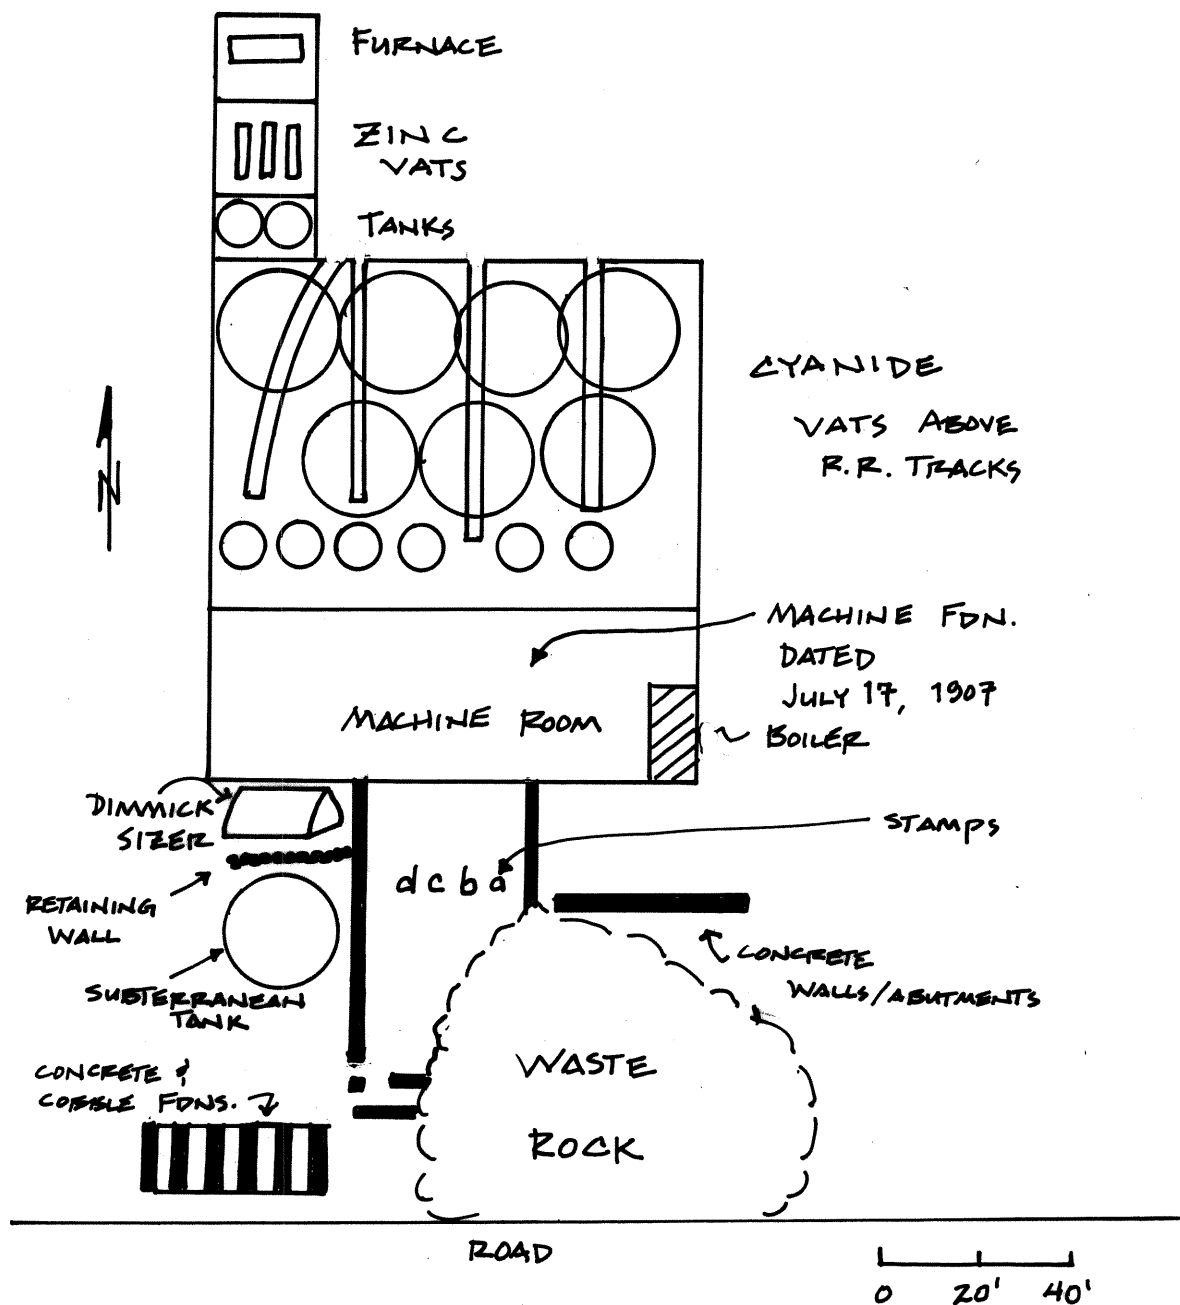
Karma site, plan of extant mill foundations. a - d = stamps and batteries.
